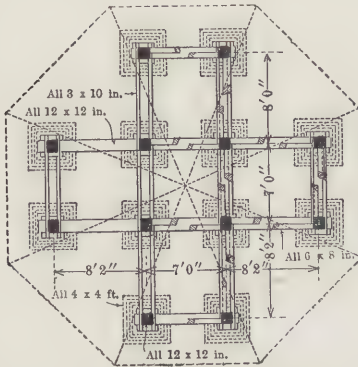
PLAN SHOWING SILLS, PIERS, POSTS, ETC.
